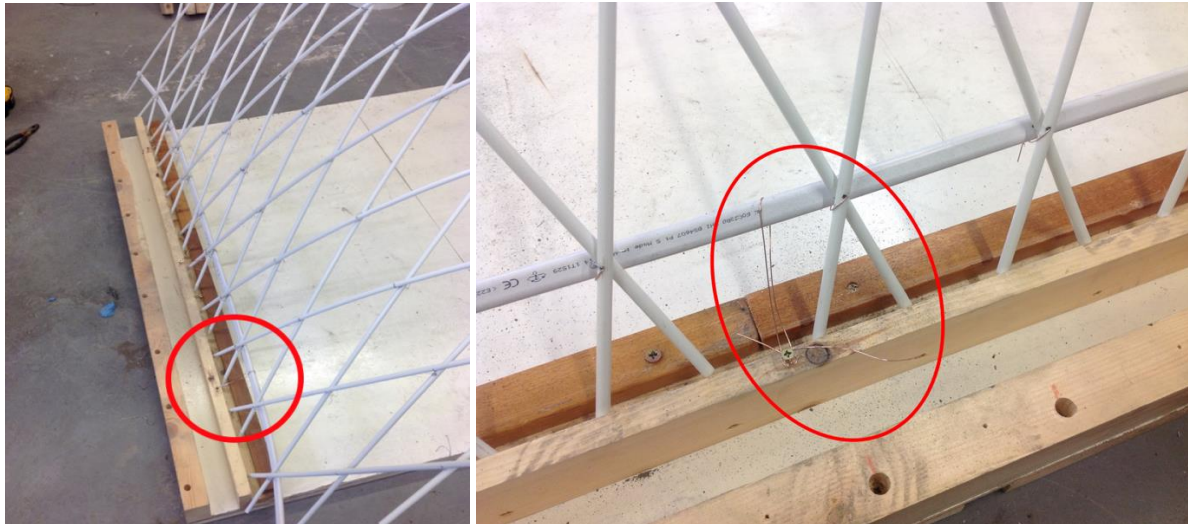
Metal wires were used to tie and attach the gridshell back to the abutments to prevent the formwork from springing off and detaching from the abutments.
